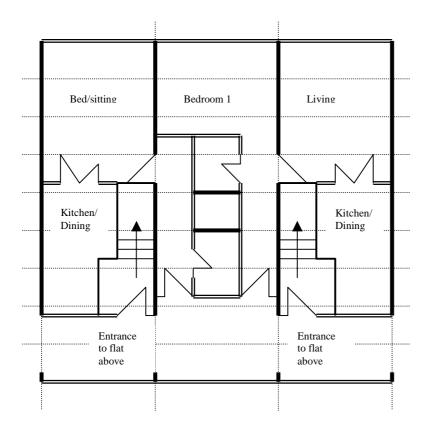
Typical flat layout on access deck level. Left: Bed-sitting room flat. Right: 1 bedroom 2 person flat. (Not to Scale)
